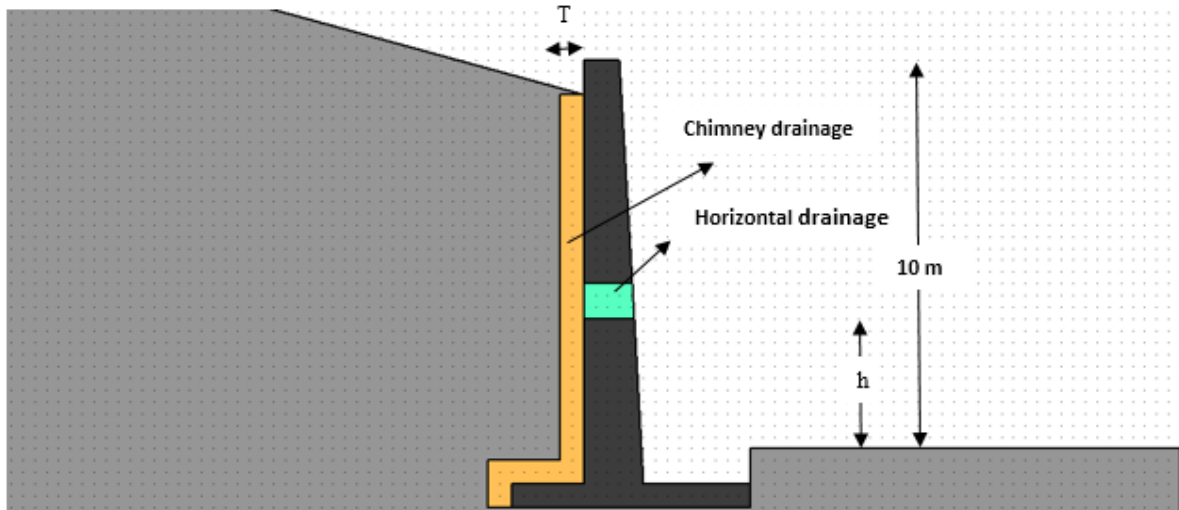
The retaining wall with 10 m height including horizontal and chimney drainage
